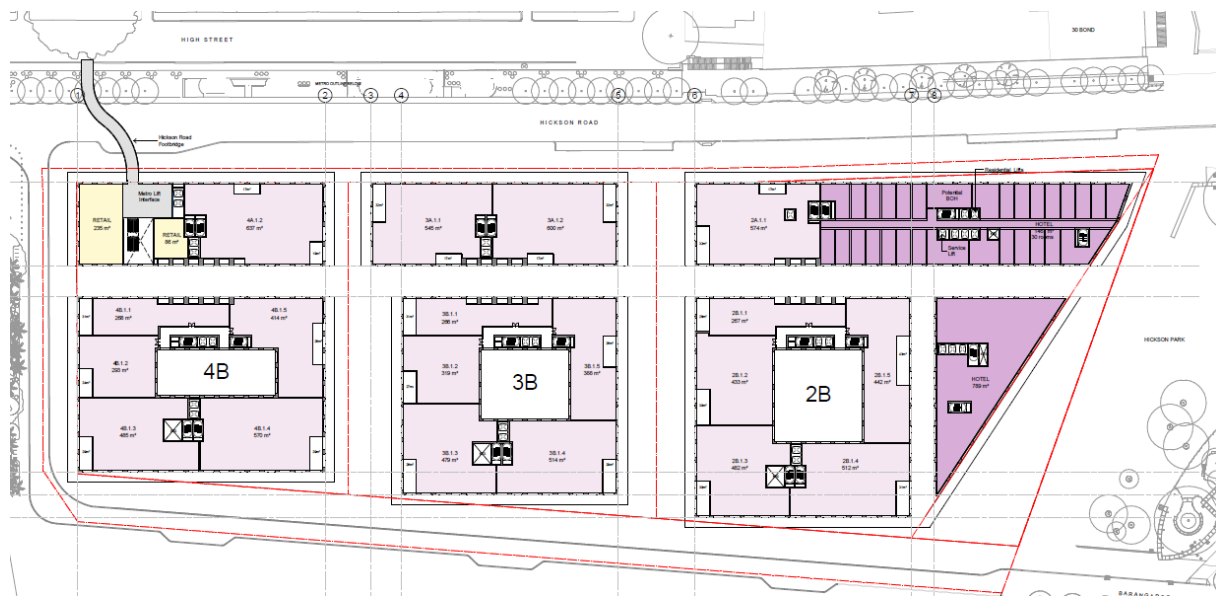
Detail of the reference design level 1 plan showing the indicative location of the footbridge from High Street to Hickson Road. (Source: SJB 2023)
